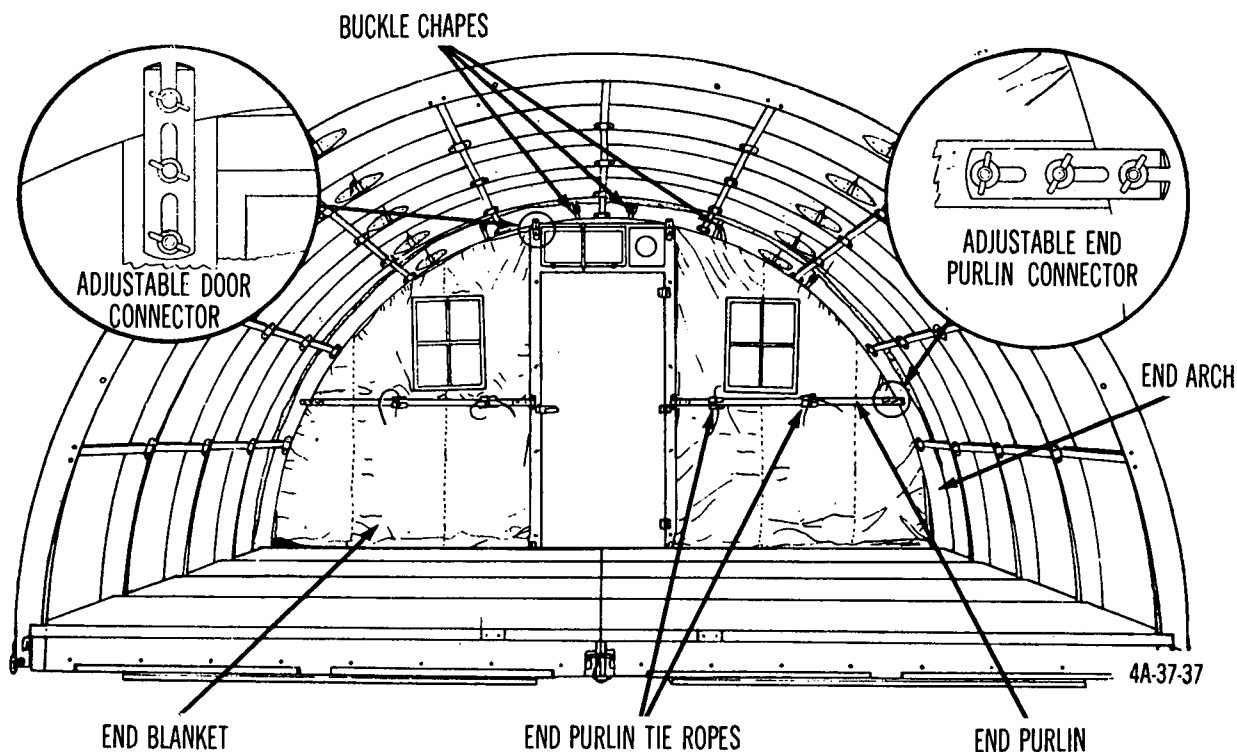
Attaching end blanket to frame of tent, frame-type, insulated, sectional (inside view).
